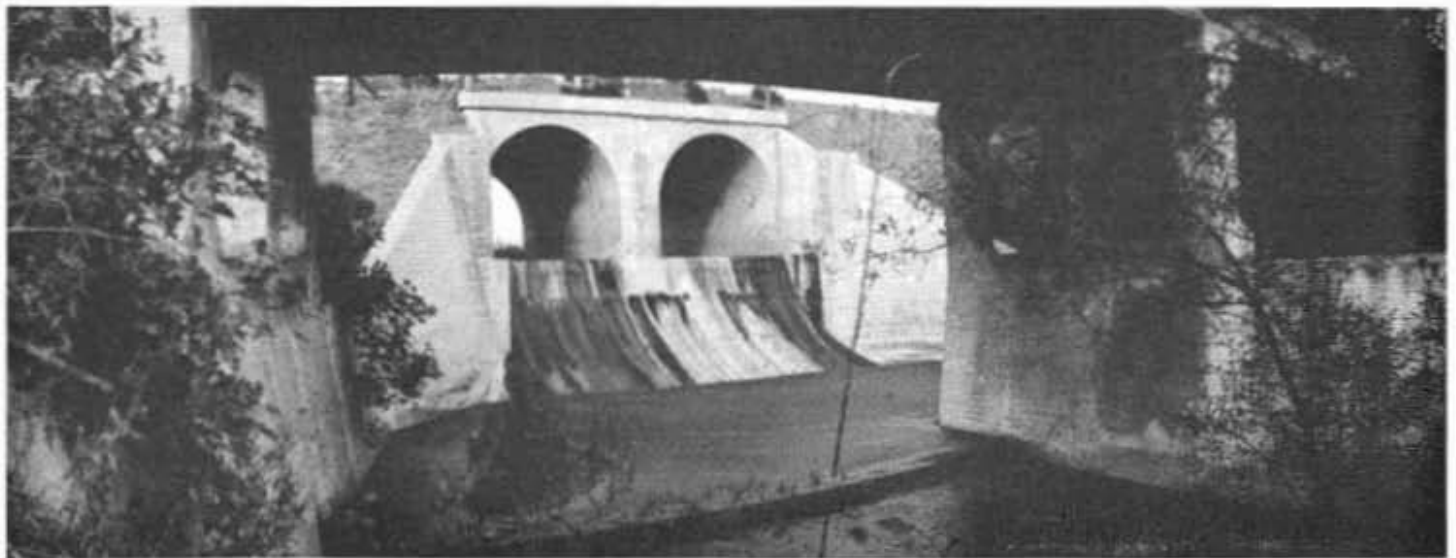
Las Flores Creek. Looking under bridge at double arch culvert of A. T. & S. F. Railway
